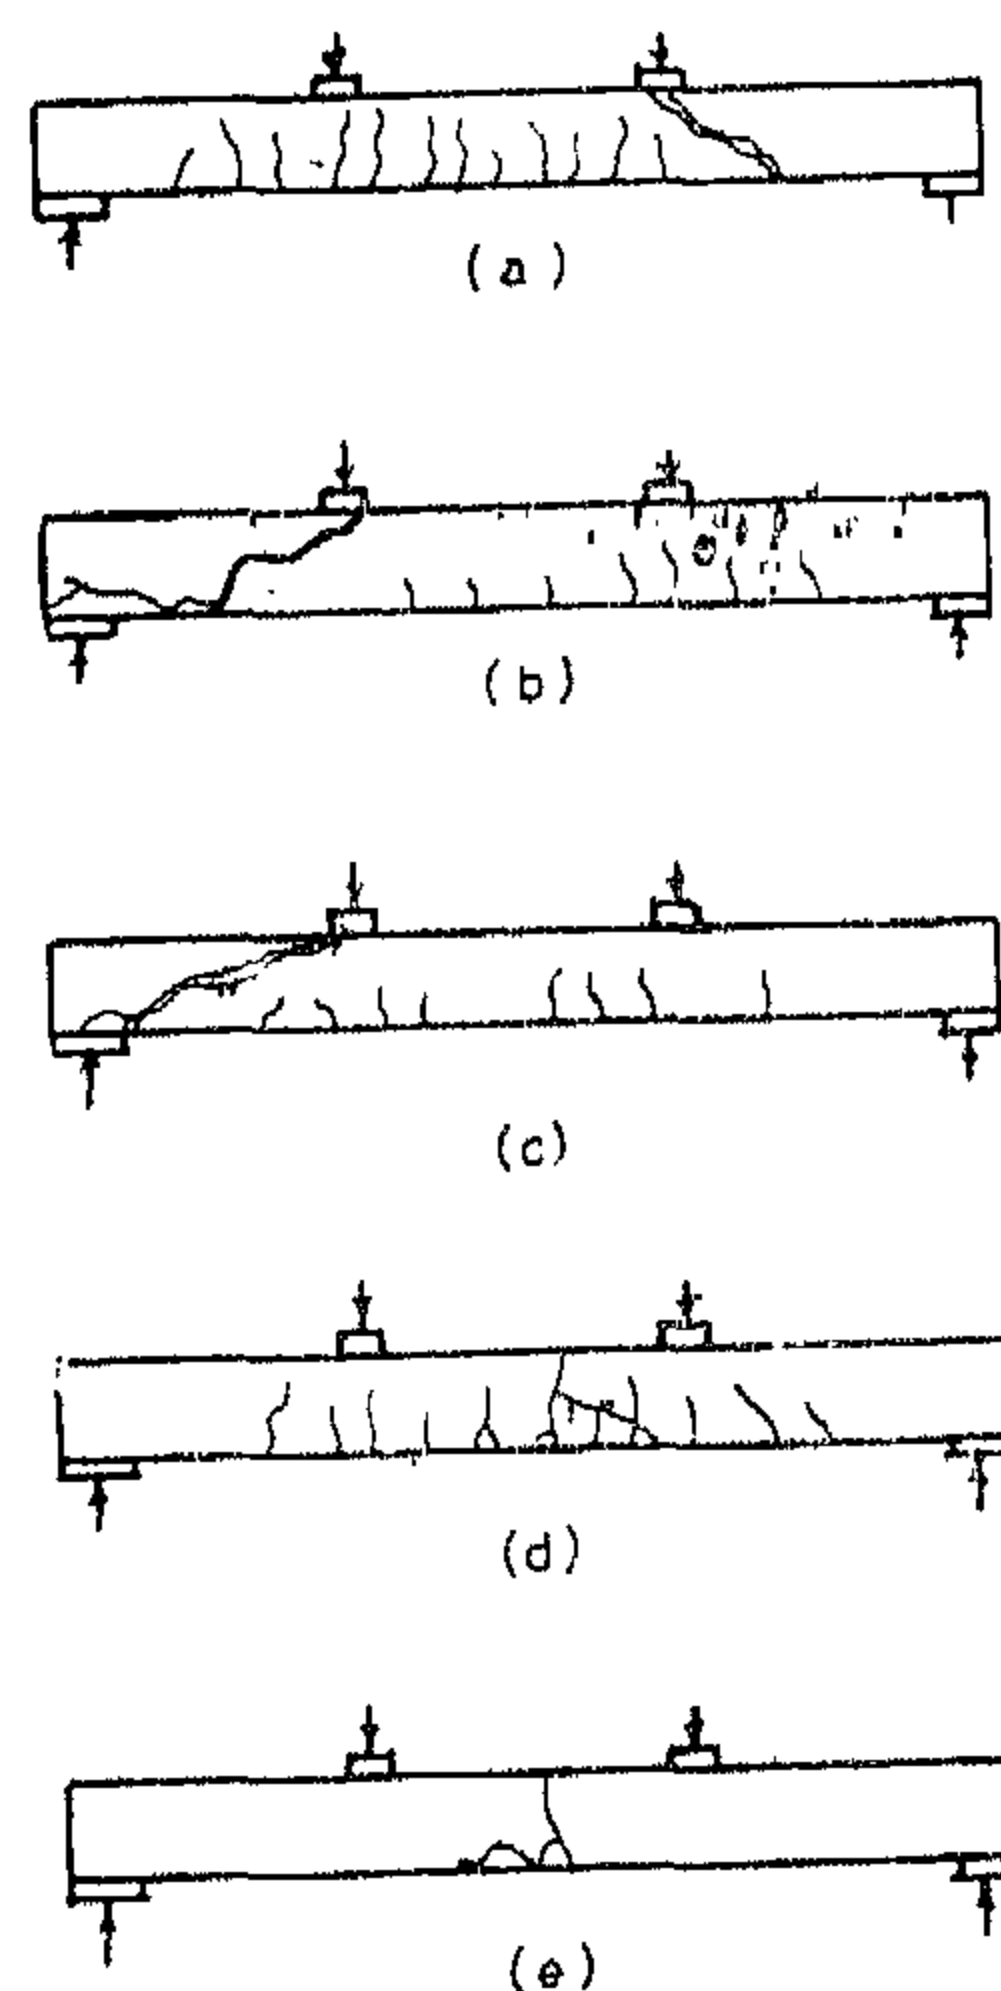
TYPICAL REINFORCED CONCRETE BEAMS FATIGUE FAILURES
